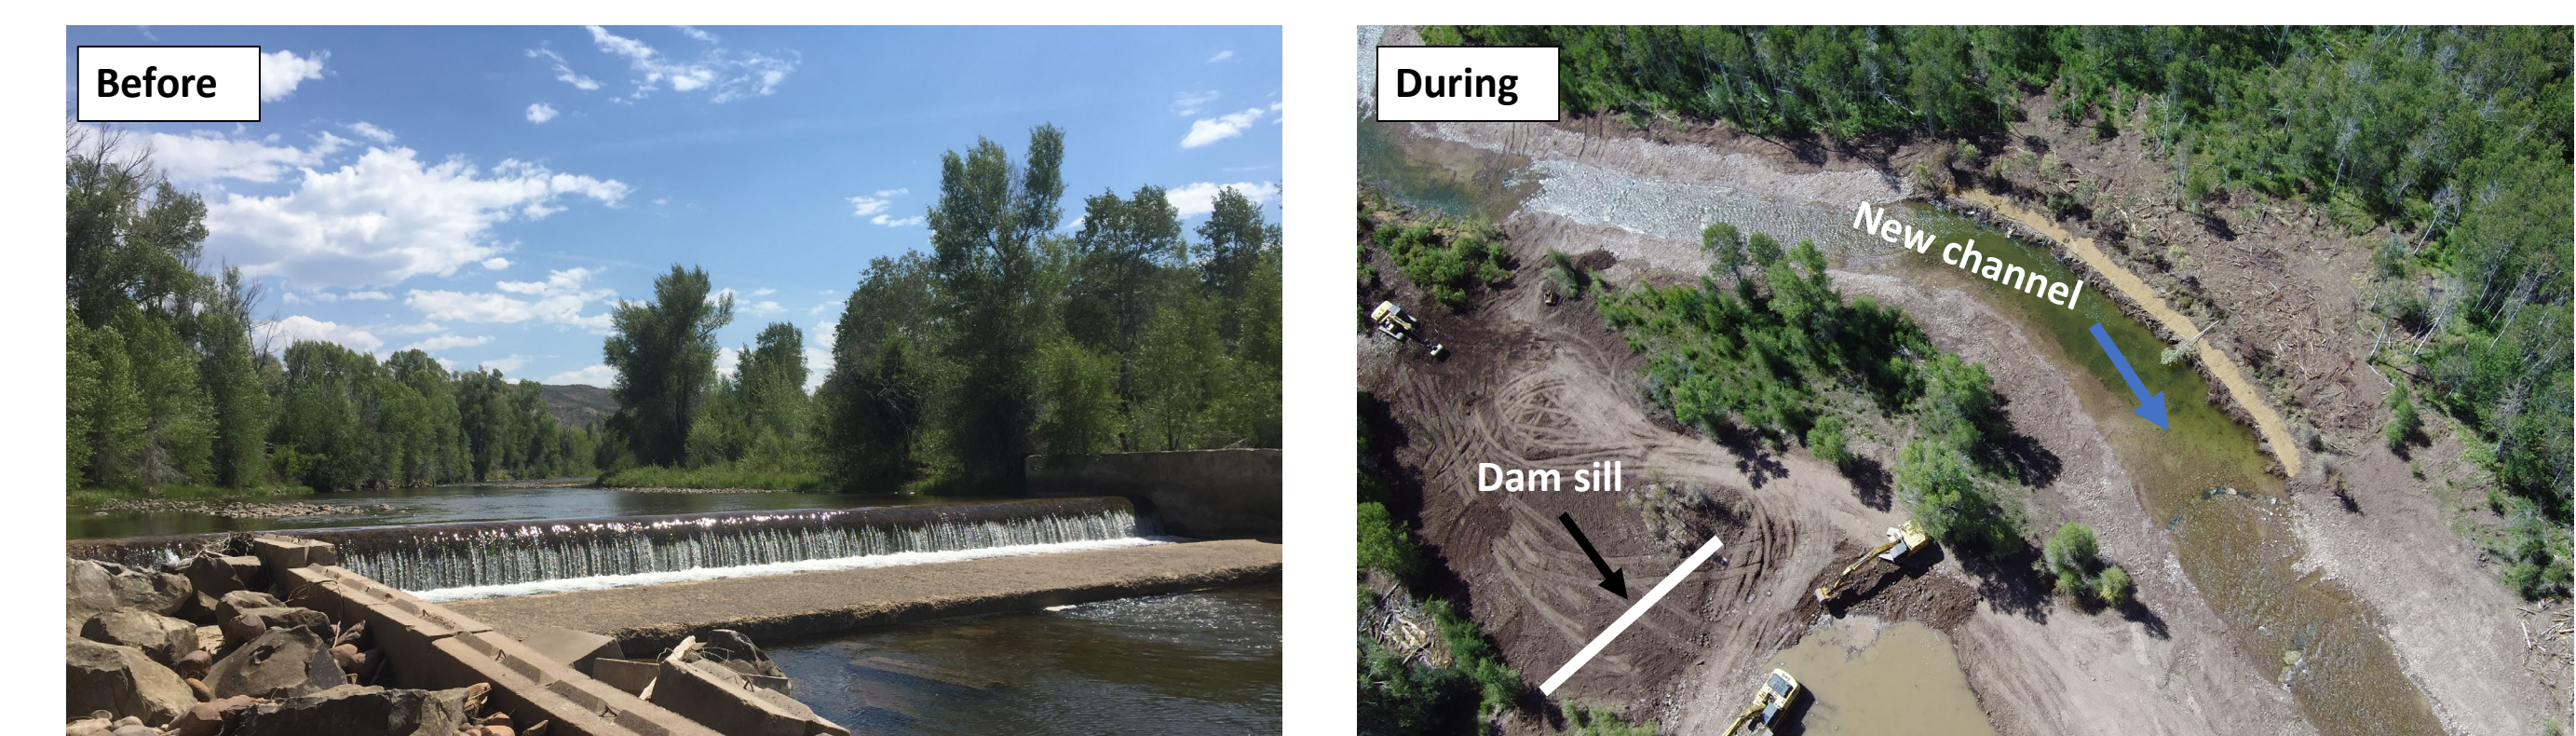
Evanston Dam was about a 5-foot drop, full-span concrete dam on the Bear River that was used to provide water to the city of Evanston prior to the early 1980s (before photo). The dam was deteriorating, but still provided water to a handful of nearby residents. The drilling of culinary wells for these households was paid for by ORF and the City of Evanston. The dam sill was buried in place and the river rerouted around it in 2022 (during-construction photo on the right). Photos by Jim DeRito and Nick Walrath.
